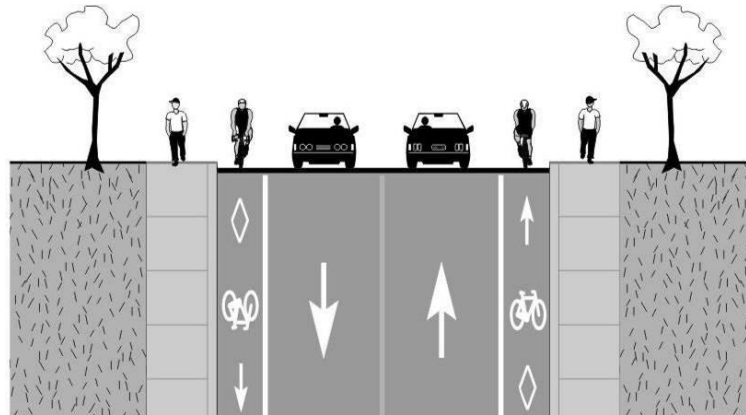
Typical Bike Lanes (Source: Halton Hills Cycling Master Plan Final Report)
